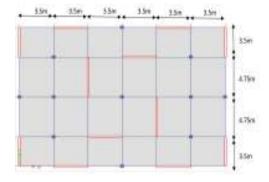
Plan of Building with 2.0% Shear Wall Ration in Each Direction
